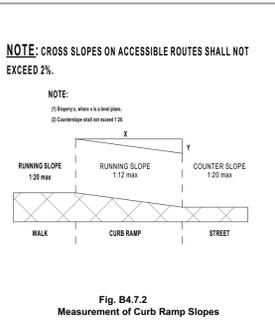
Measurement of Curb Ramp Slopes
